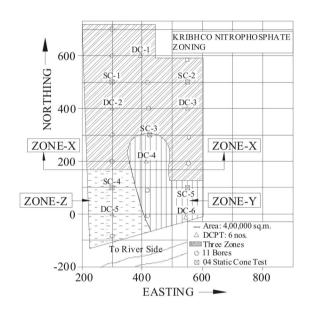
Typical Zoning Plan by DCPT to Plan Detail Exploration (Desai M.D.)
